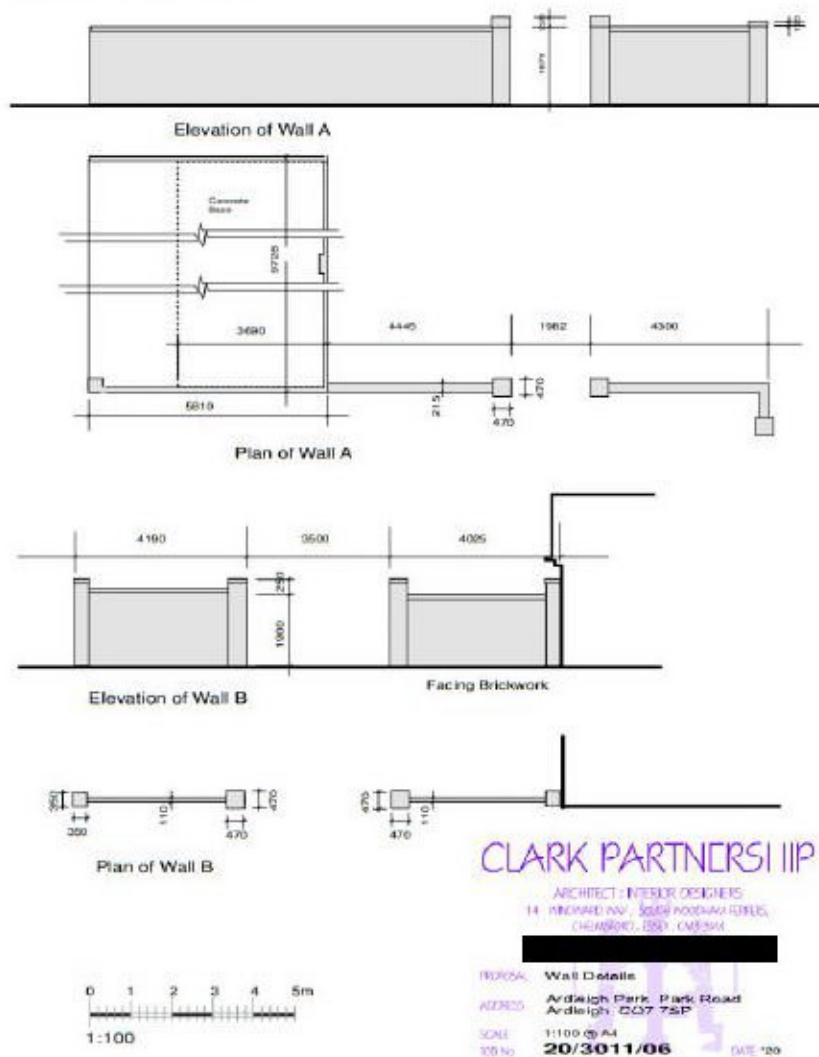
modern wall details, as built, apart from the stone balls to the piers to match the Walled Garden.
